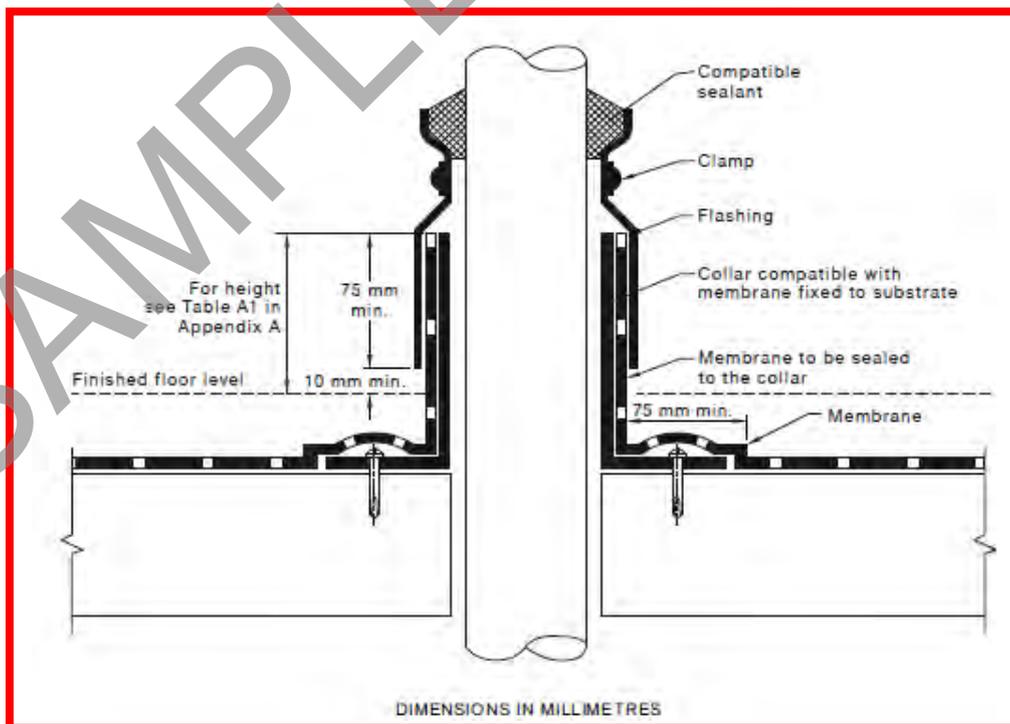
Figure 2.10 - Typical Details Of Vertical Penetration Using A Collar.
